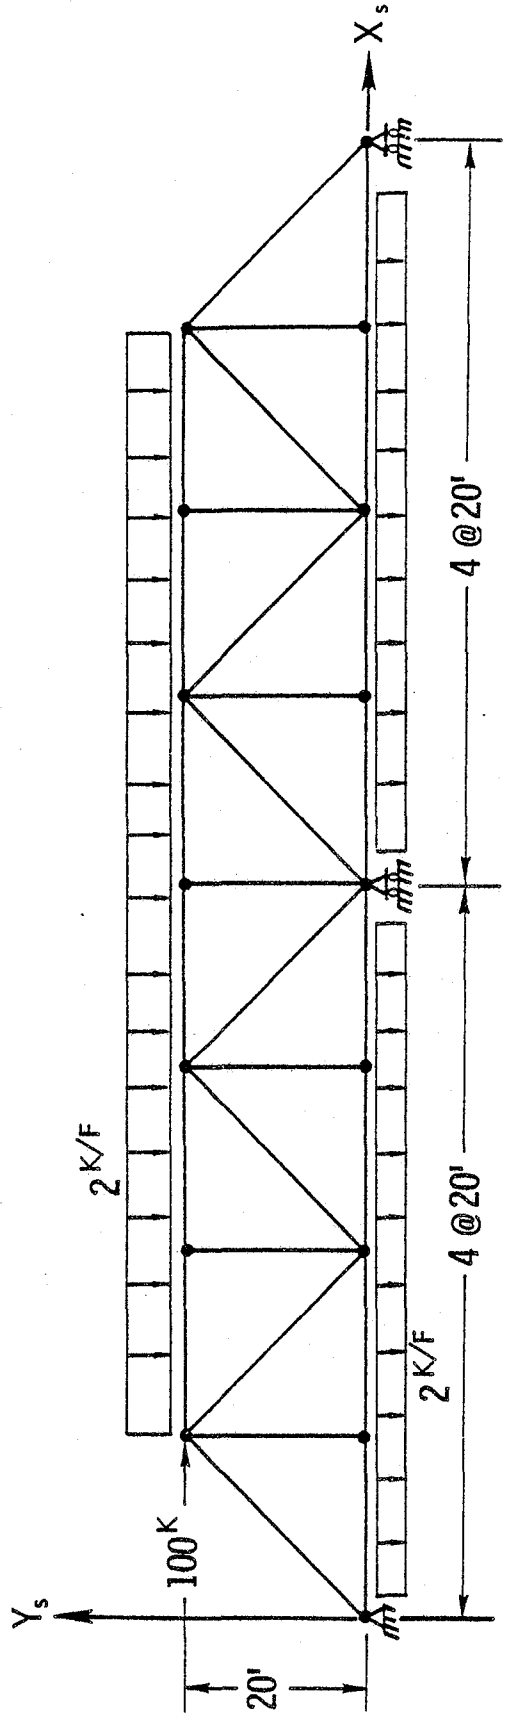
Bridge Structure to Illustrate Substructuring
